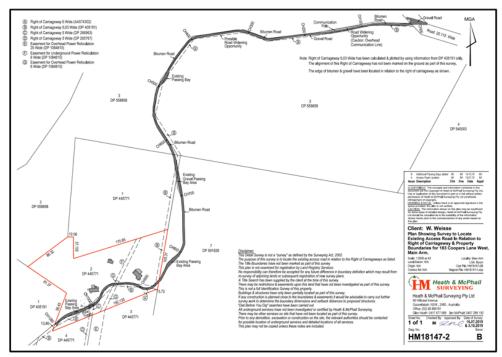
Location of the existing property access road and proposed/existing passing bays over Lot 1, 2 and 7 and some widening in the existing easement within Lot 3.
